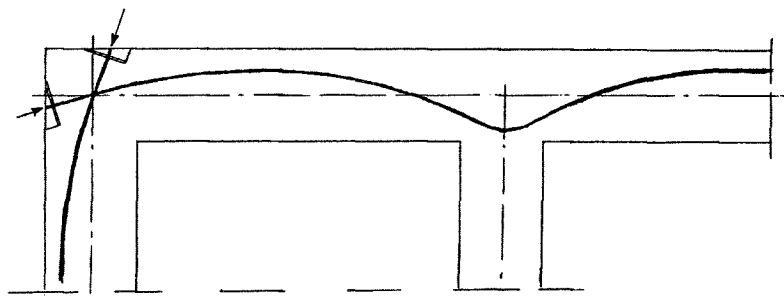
Rounded placement of the prestressing steel reinforcement
